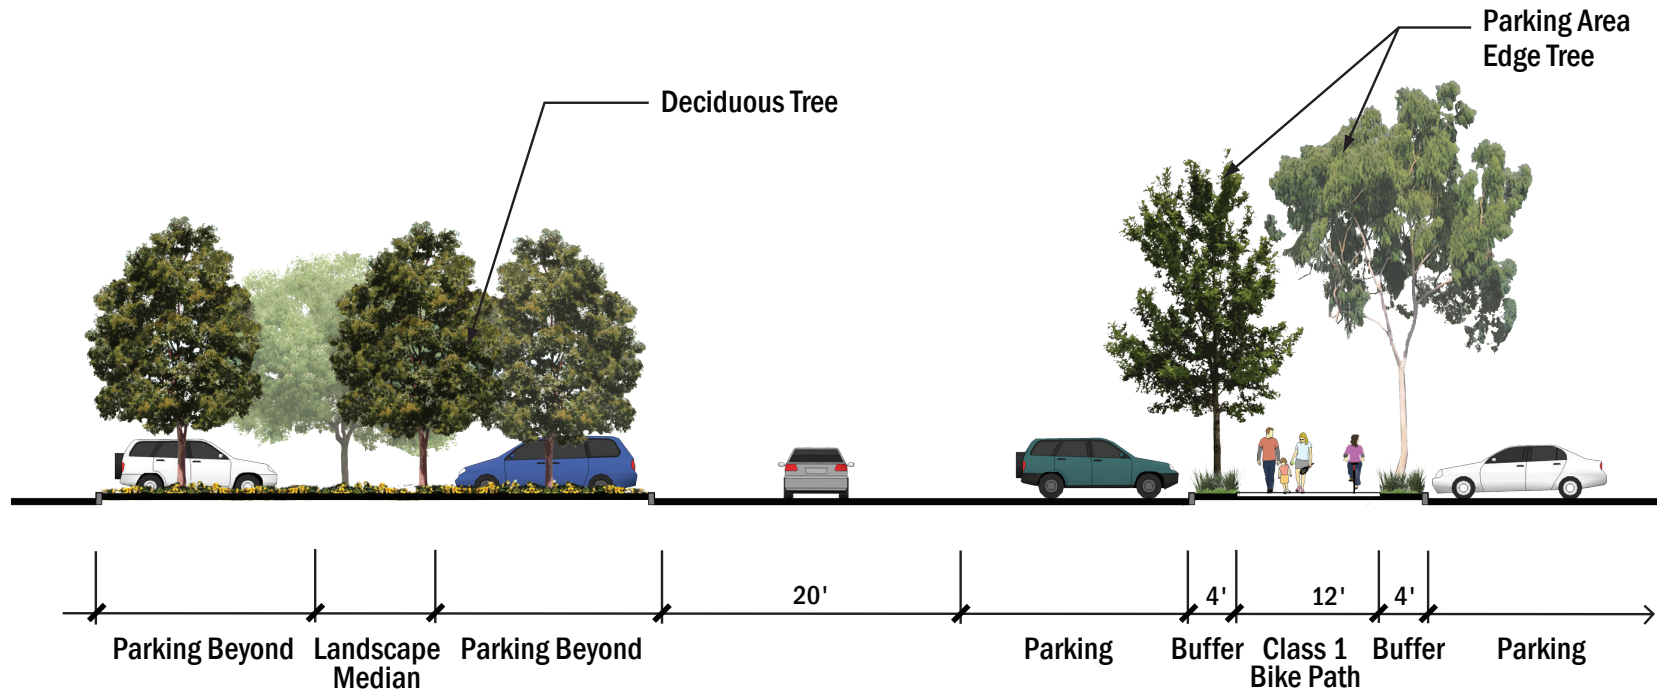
, Streetscape Conceptual - Fullerton Tennis Center Parking
